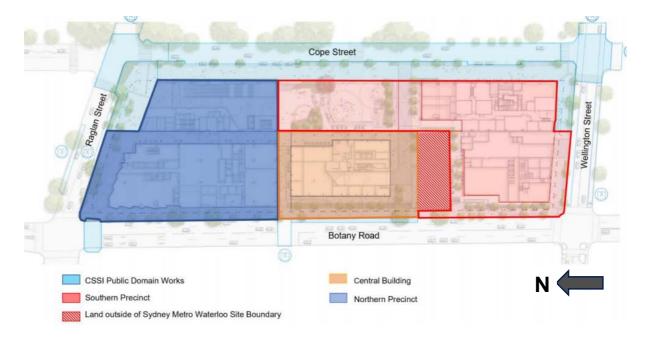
| Site plan of the Precincts within the site (Source: Applicant's EIS)
